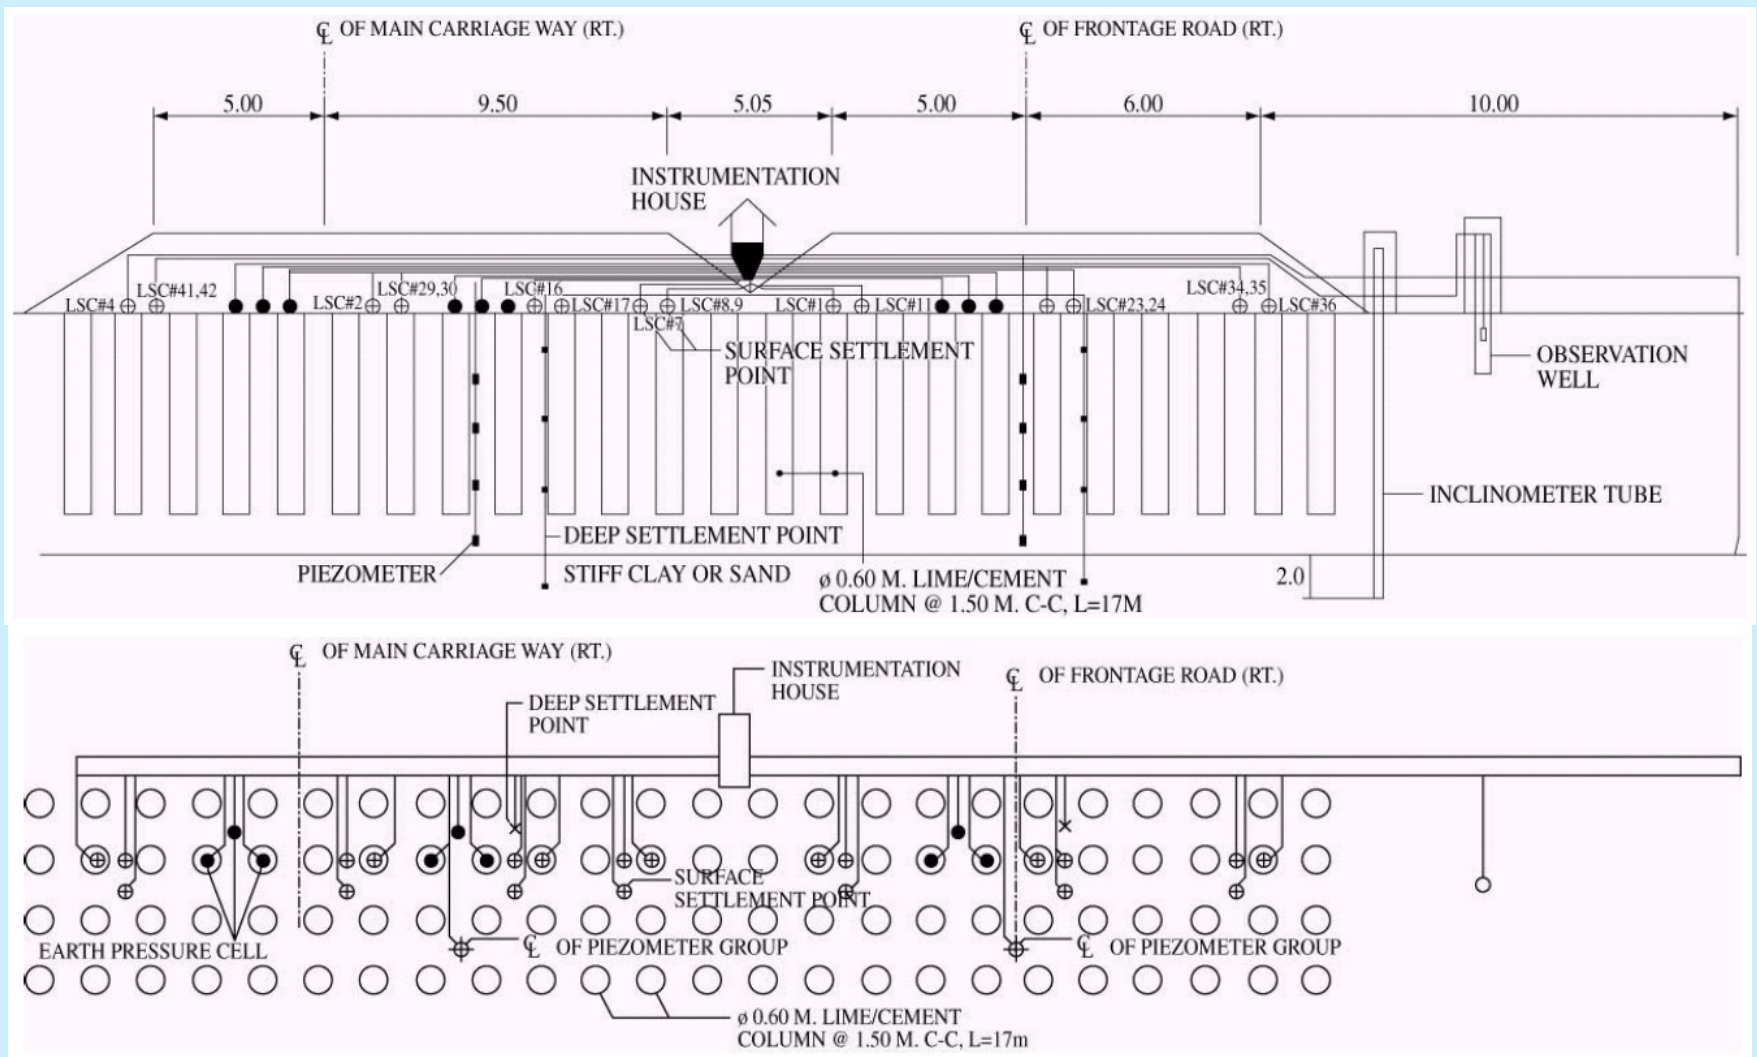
Monitoring section of Expressway widening project near Bangkok
